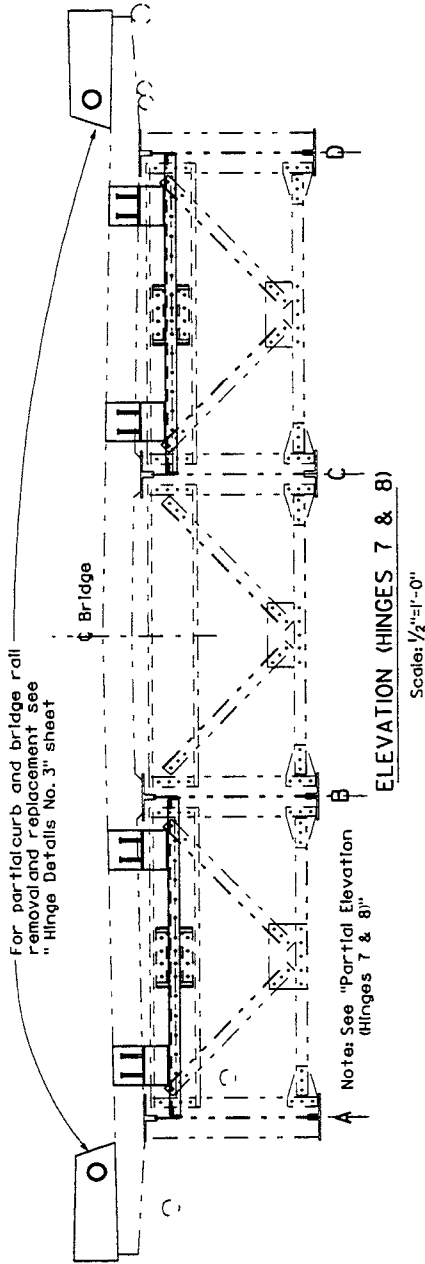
Steel Girder Hinge End Diaphragm Shear Keys
